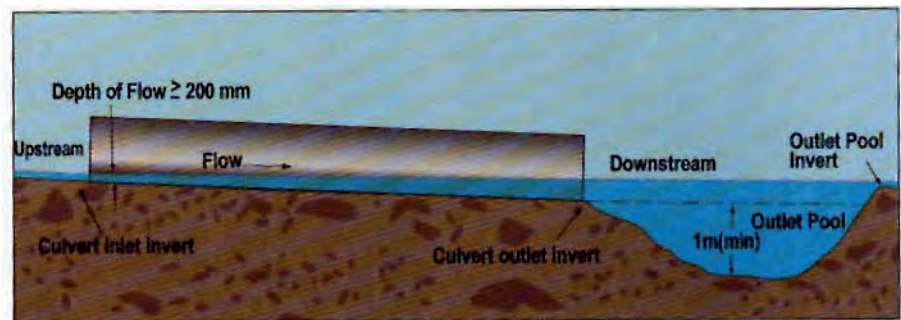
Culvert Installation Showing Downstream Pool to Maintain Minimum 200 mm Water Elevation Throughout Culvert.
